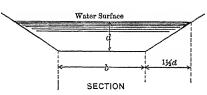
(Part 1 of 3).—Hydraulic Elements of Trapezoidal Sections.
